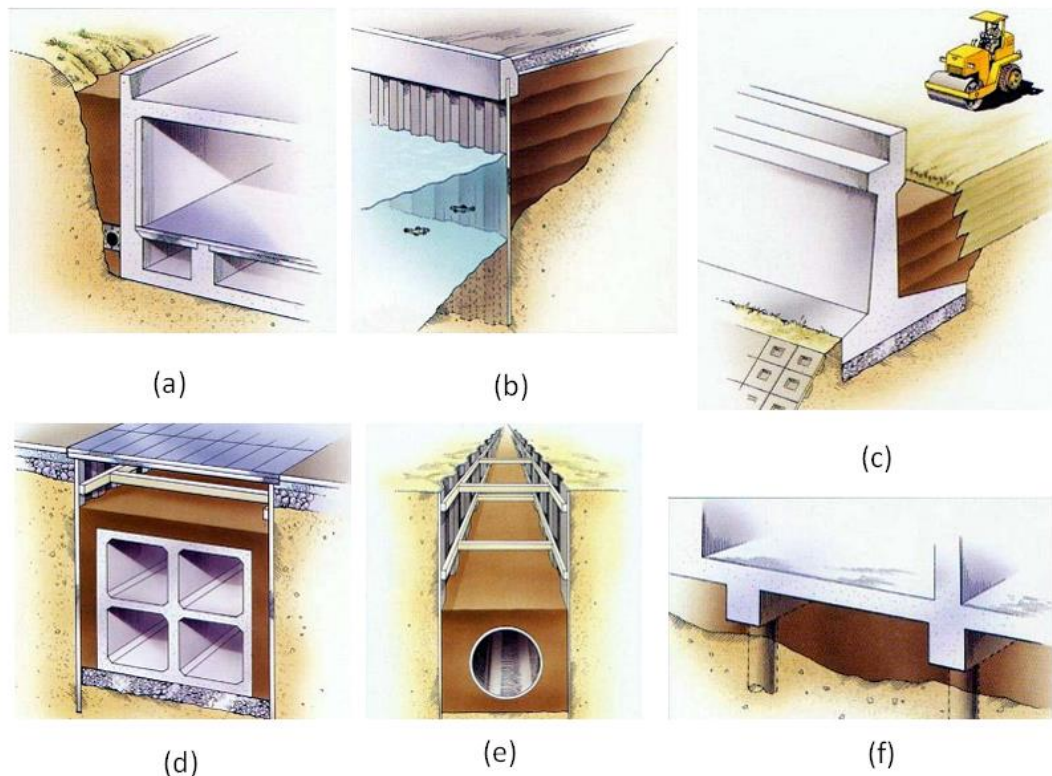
Using LSS for various backfilling works in Japan; (a): backfilling of building foundation; (b): backfilling of the underwater seawall; (c): backfilling of abutment; (d): backfilling of box culvert; (e): backfilling of the underground pipe; (f): filling of underfloor due to subsidence
